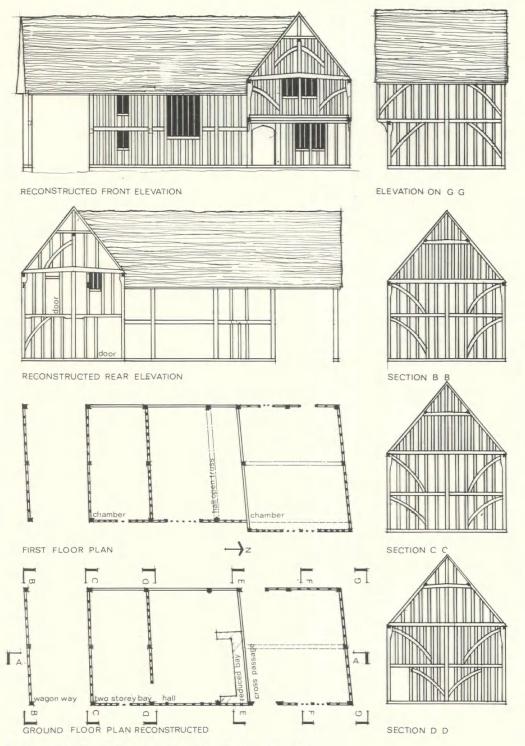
Sun House, Potton: plans, elevations and sections. Scale as figure 6.
